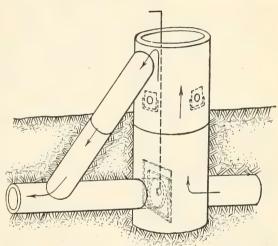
Overflow distributing hydrant. Wasteway pipe set on angle to prevent air troubles.
